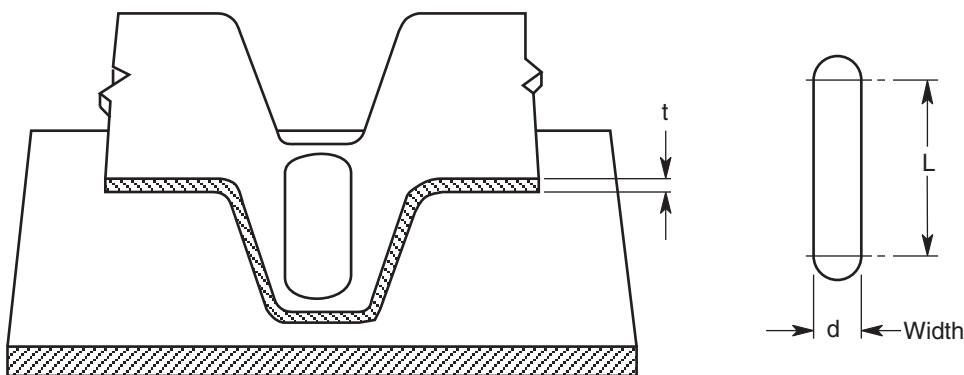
Arc Seam Welds - Sheet to Supporting Member in Flat Position
